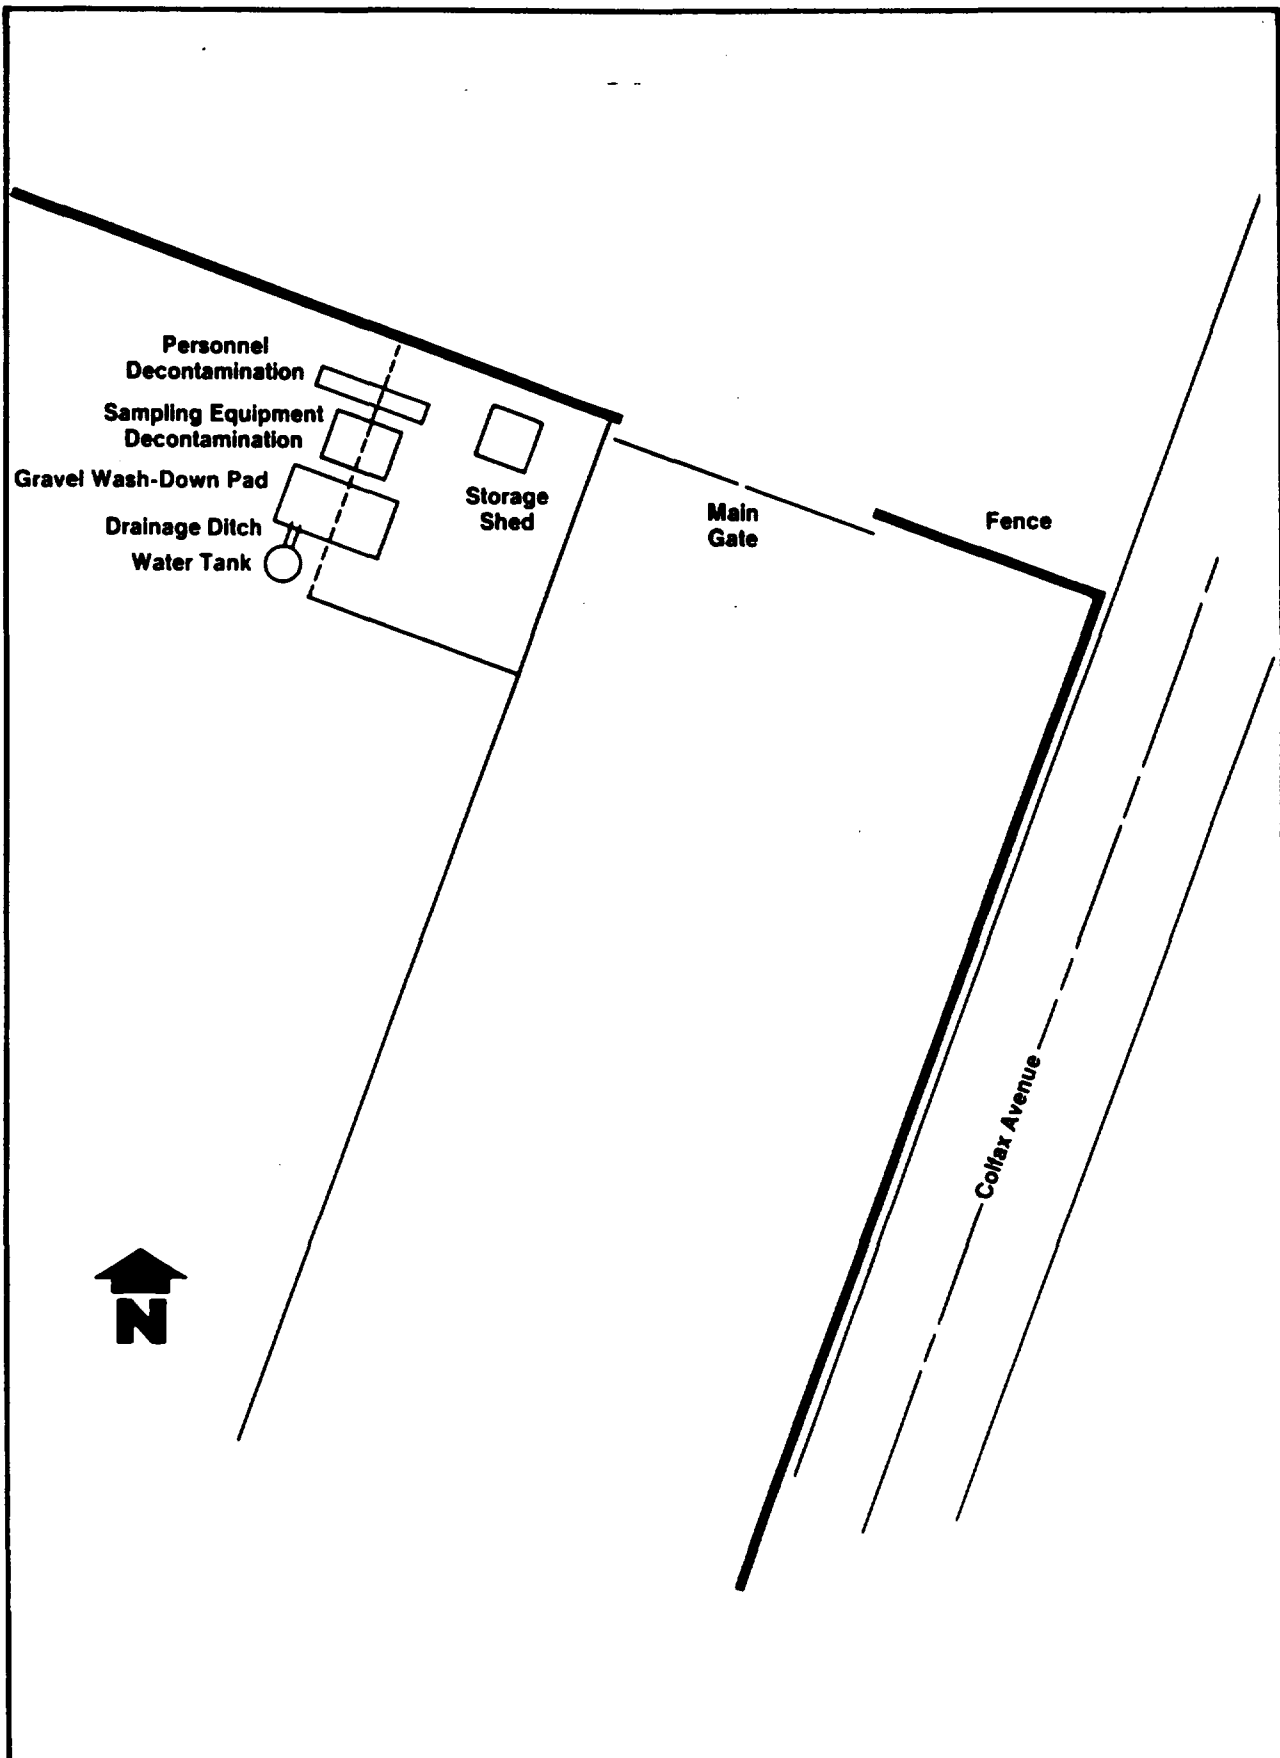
SECONDARY SITE FACILITY SCHEMATIC
